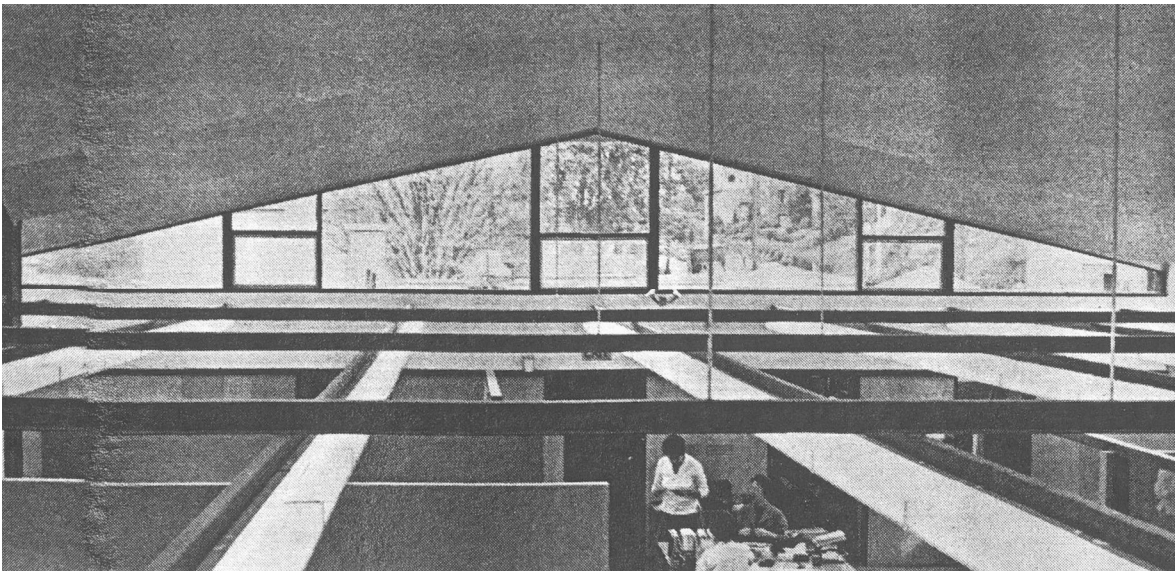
Interior Photo-Top Floor looking E.-“A New Roof Over PA&B”-*Pacific Architect & Builder*,” 1/1961
